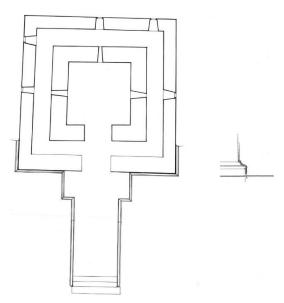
The Great Shrine. Plan with detail of the podium's moulding. For dimensions and scale, see *Dimensions* above, and Pls III-IV (Drawings by FM).
